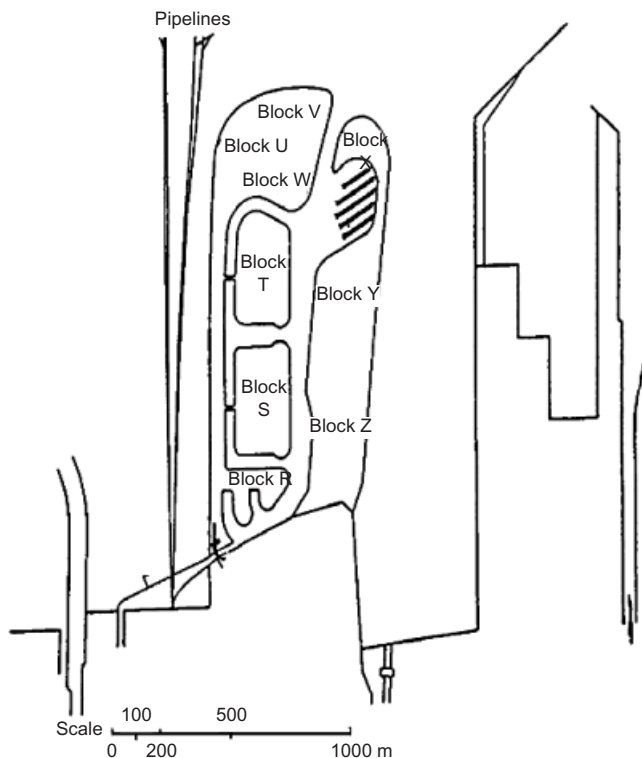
Site plan of Pantai Mutiara reclamation in Jakarta, Indonesia
